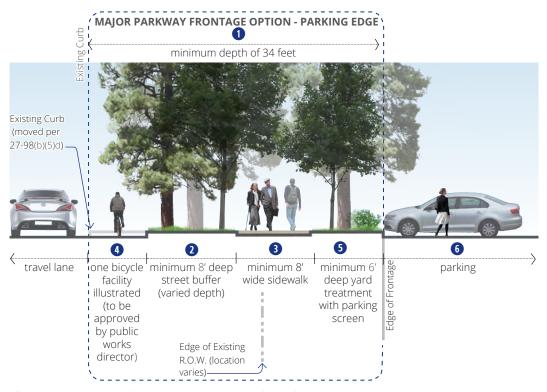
Major Parkway Frontage Option - Parking Edge
